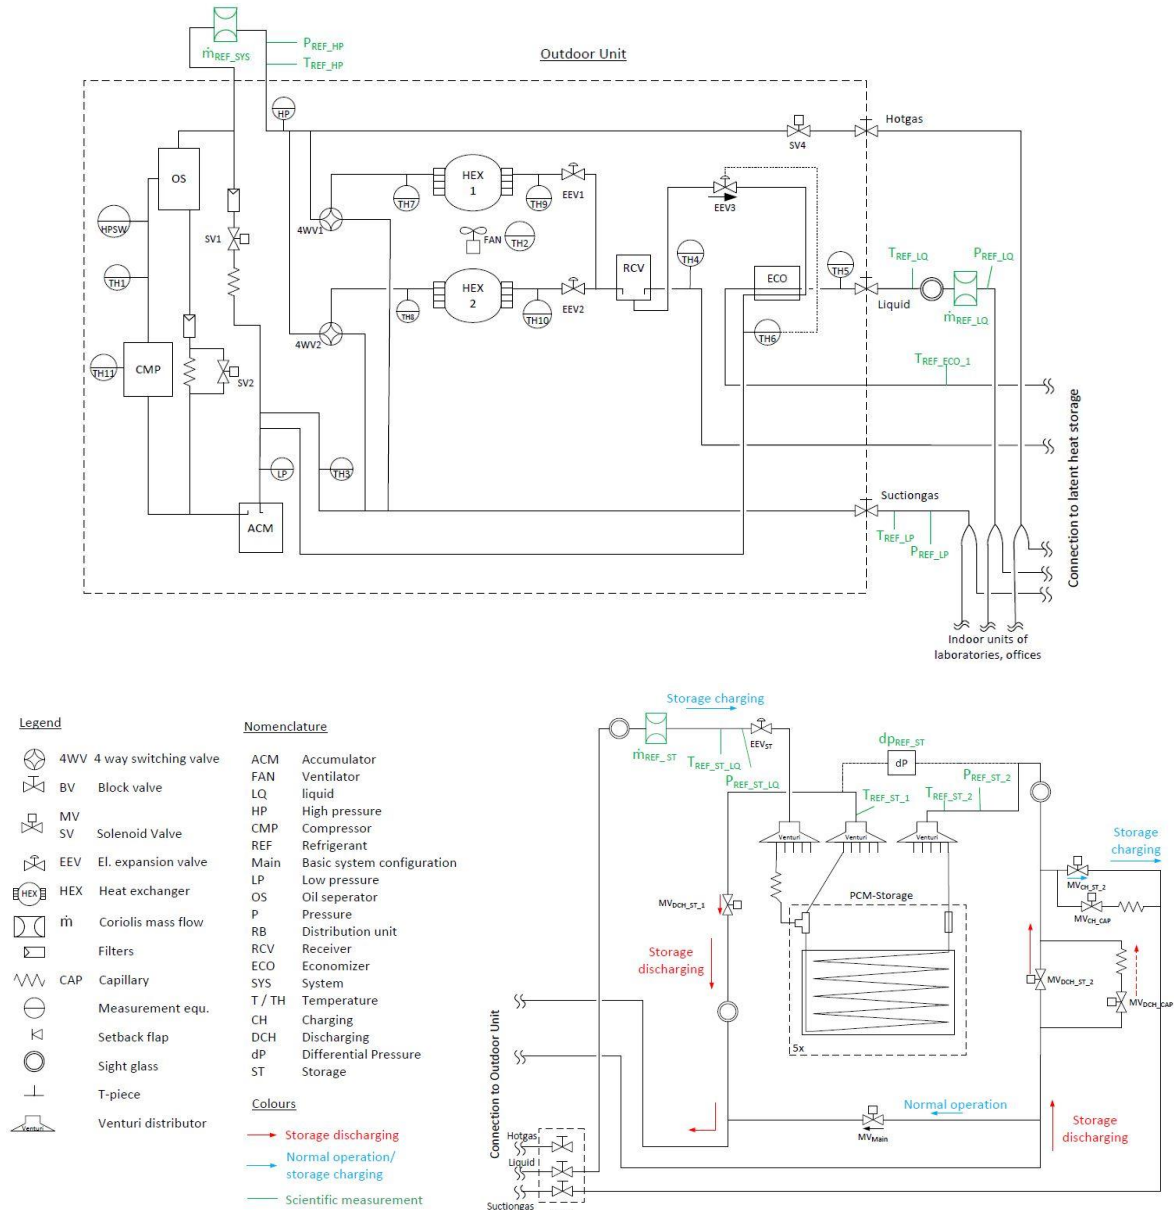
Systems P&ID including outdoor unit, storage connection and measurement equipment of the pilot installation.
